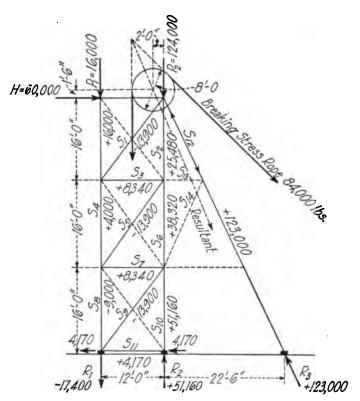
Stresses in Head Frame, Back Brace Redundant.
